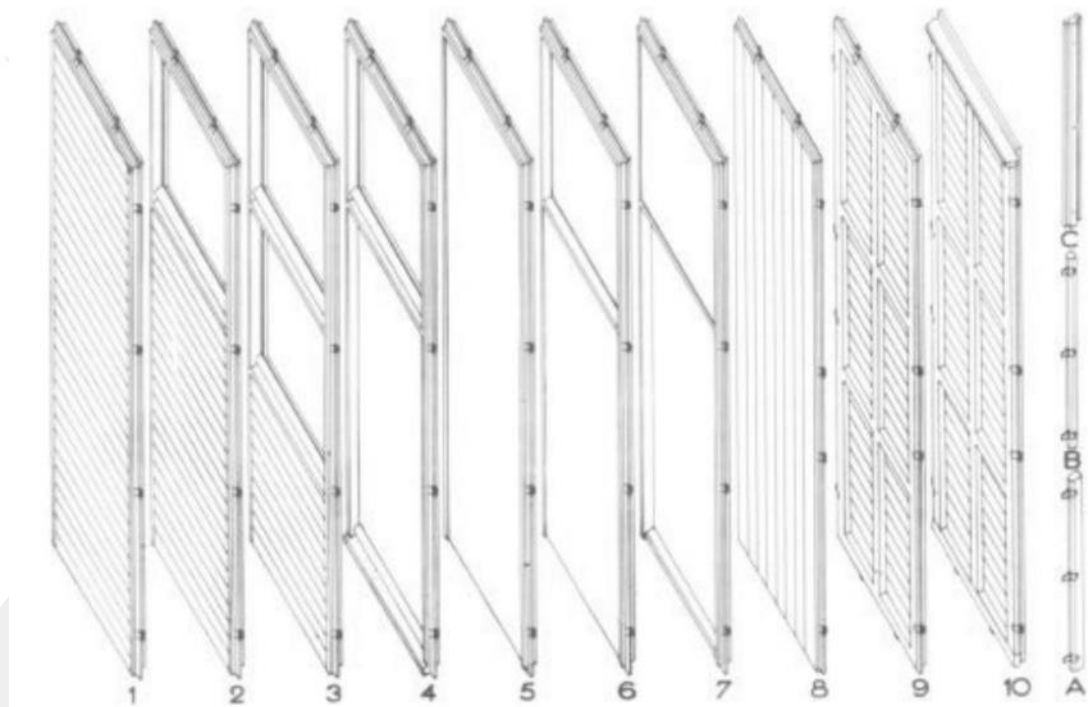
Exploded Isometric 3D View of the Packaged house panels redrawn by the author (P-42, Tables 4.1.1 & 4.1.2)
